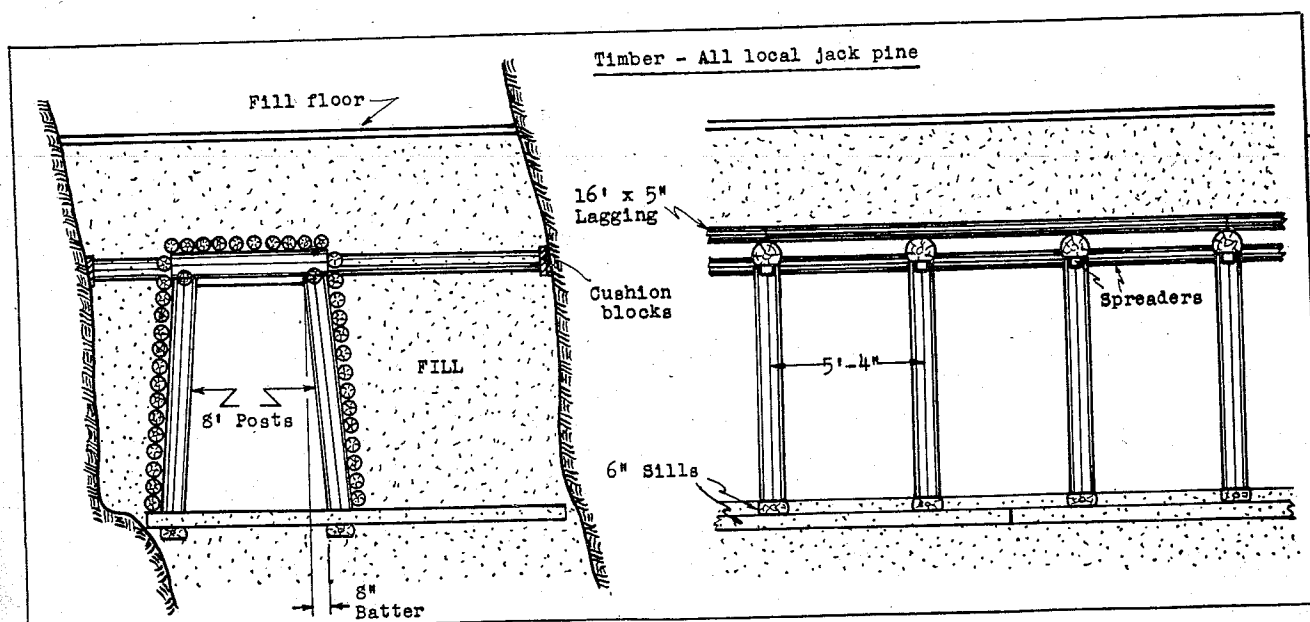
Stope Drift Timbering after floor pillar has been extracted.
